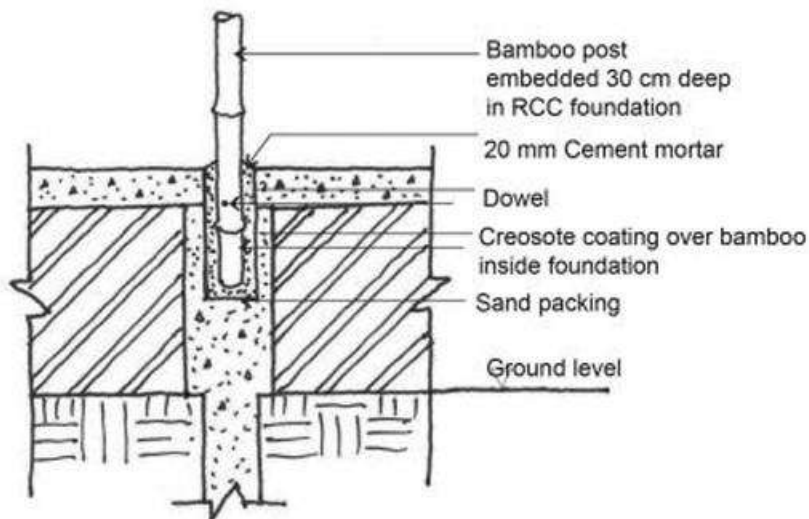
57 Concrete foundation plinth for bamboo construction.
